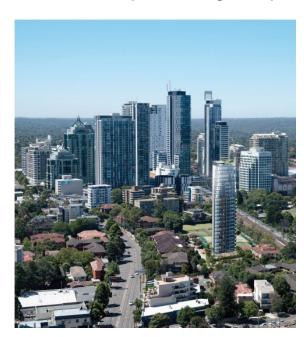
3D View of the Proposed Building Envelope Looking North East
